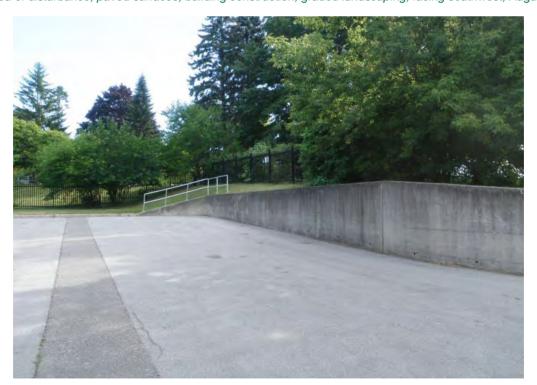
Area of disturbance, paved surfaces, retaining wall and slope, graded landscaping, facing east, August 5, 2015.
